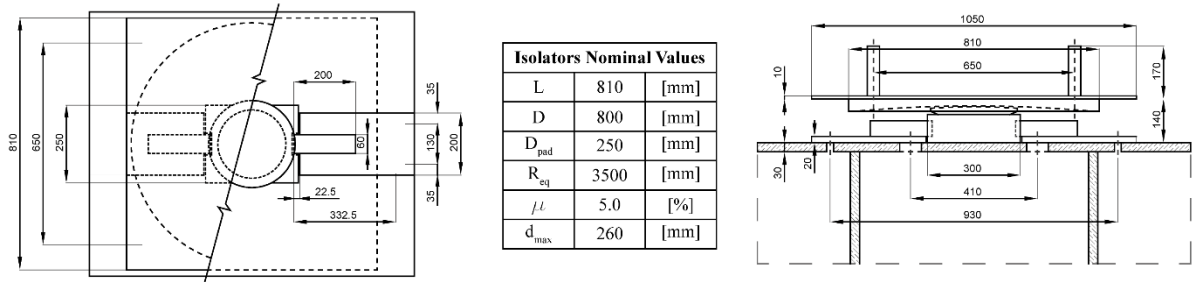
Technical drawings and nominal parameter of ALGA bearing.
